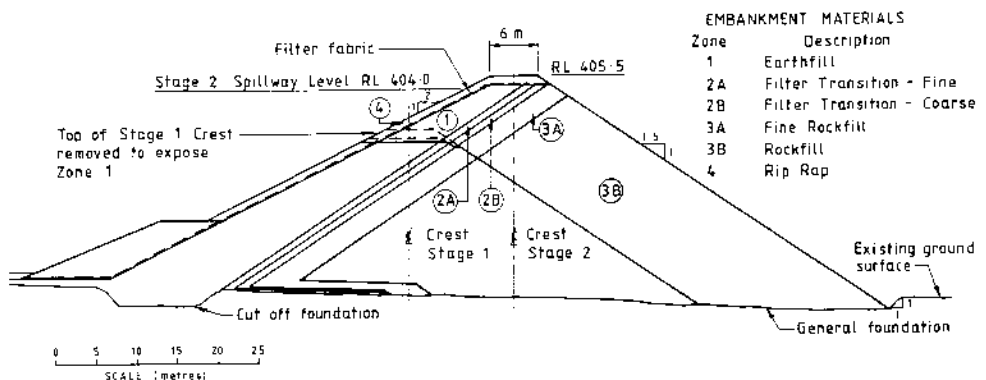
Staged construction, proposed Ben Lomond tailings dam (Coffey & Partners 1982).
